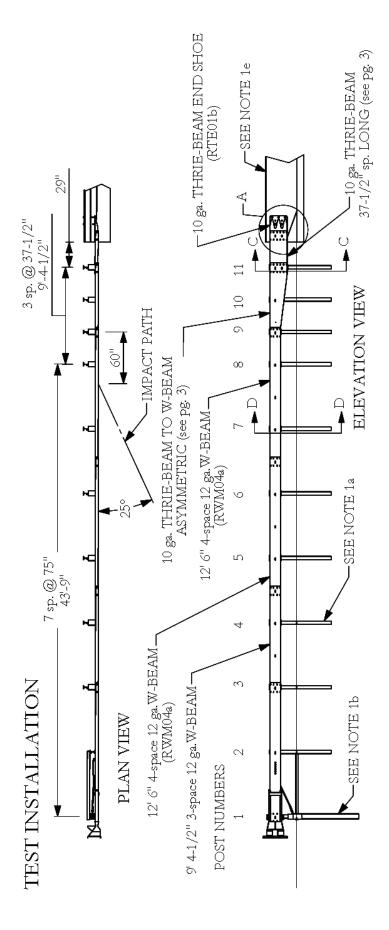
Details of the MASH TL-2 Transition Installation.
